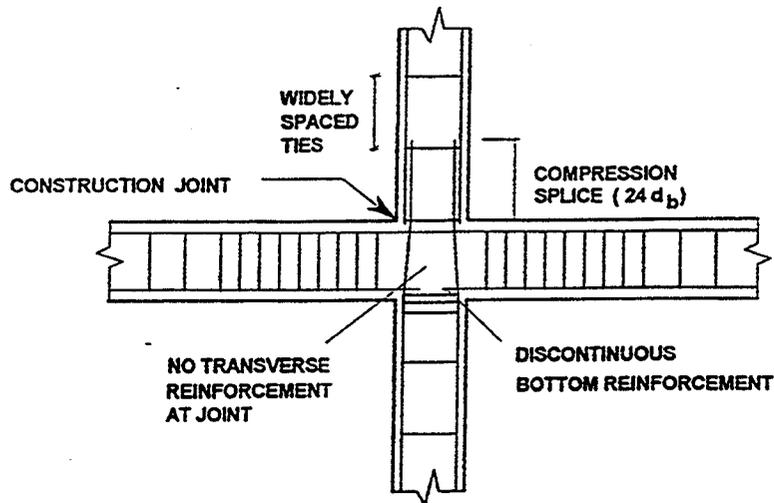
Typical weak links in existing reinforced concrete moment resisting frames
